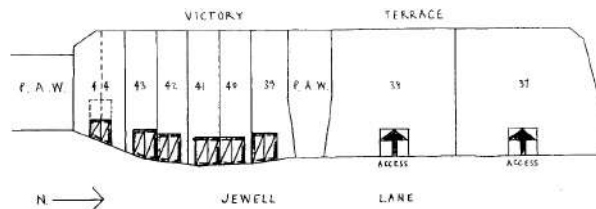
On-Site Parking Location and Access Lot 37 to 44
